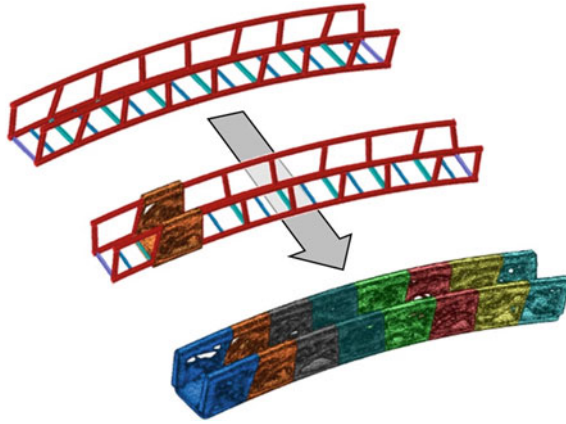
Substructure and building process of the footpath bridge (Acciona 2019)
